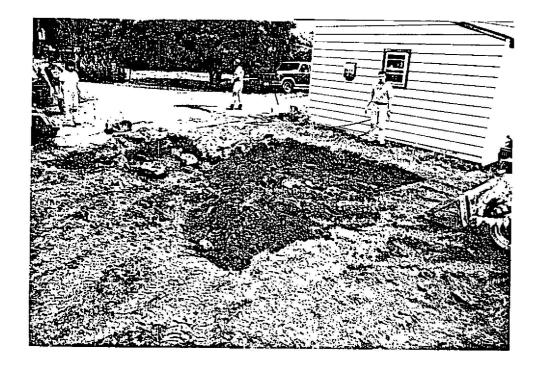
Tests 3 and 4 after excavation, viewed from southeast
